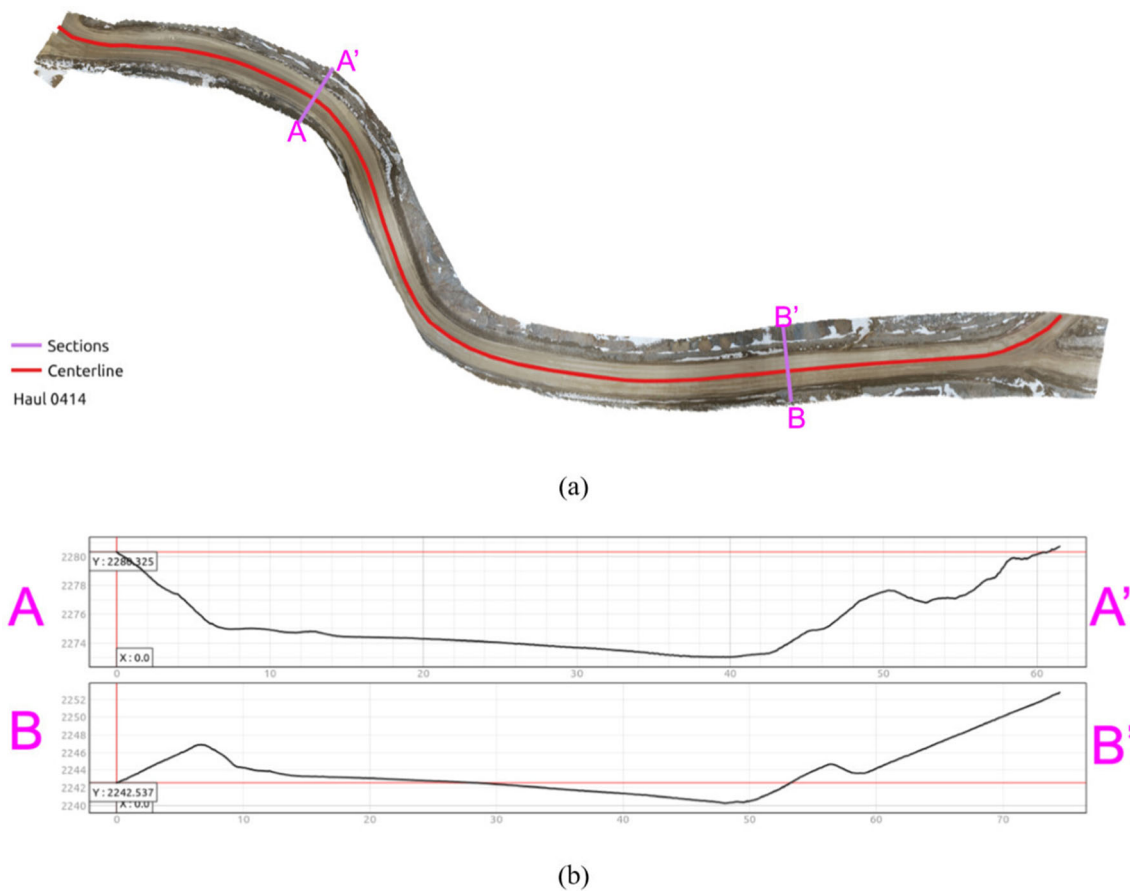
a Orthophoto of the road between Top 2B pit and the waste rock dump; b cross-section of the road
